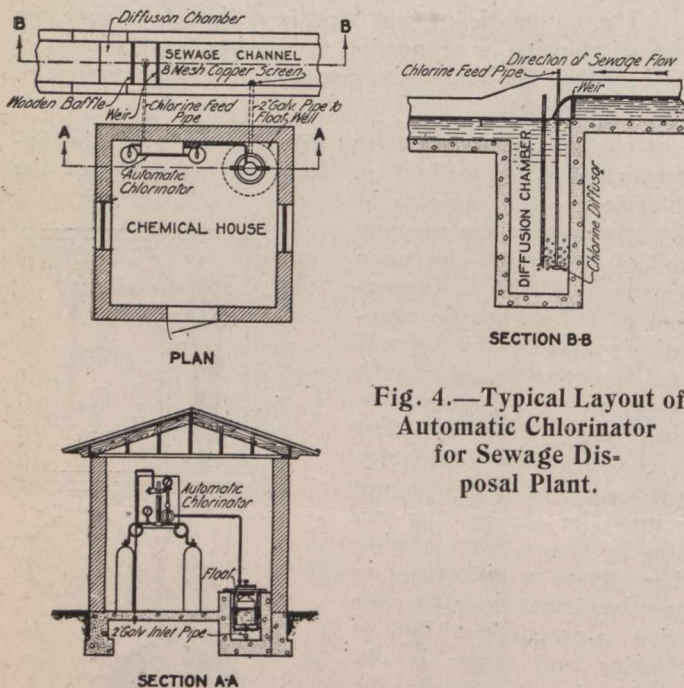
Typical Layout of Automatic Chlorinator for Sewage Disposal Plant.
